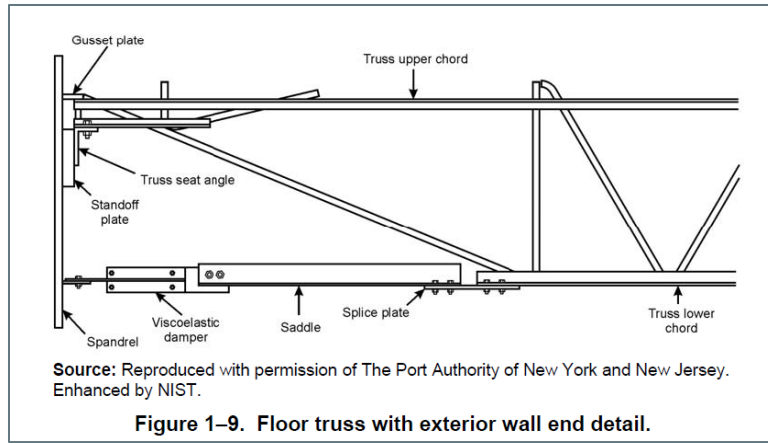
Perimeter connection to floor truss showing viscoelastic damper.
